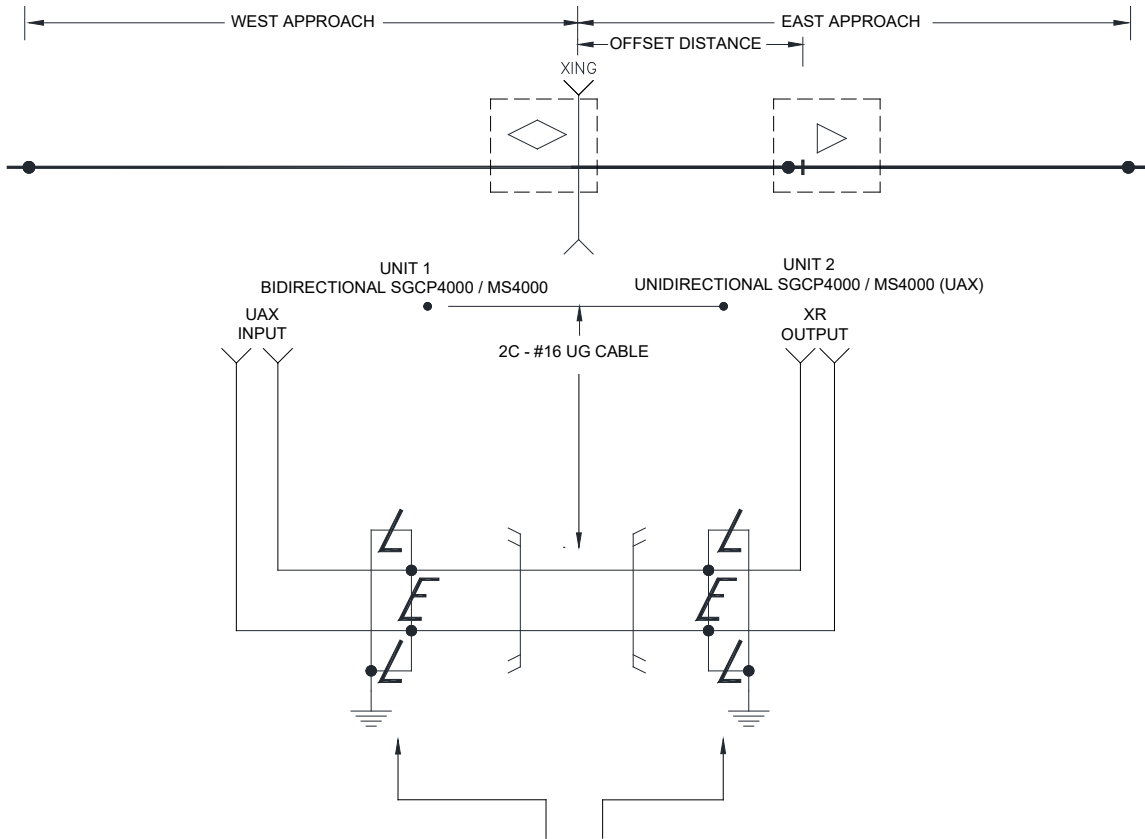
Typical Track Wire Surge Protection for 4 and 6 Wire Track Connections
